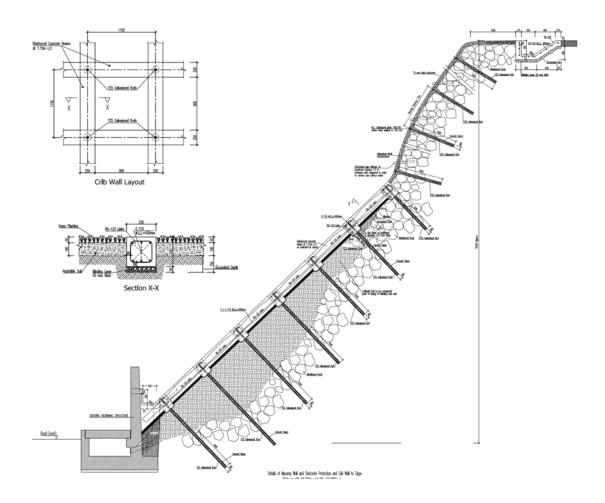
Detailed design of the countermeasure works (crib wall works, shotcrete works), Batelarge (Source: MPI)
